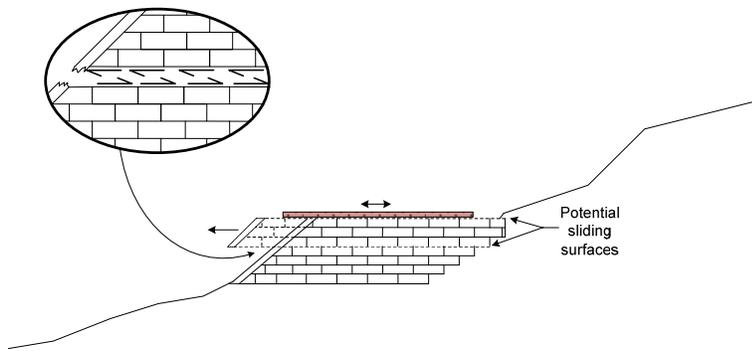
Internal seismic stability failure involving horizontal sliding between blocks and/or between the pavement system and upper layer of blocks due to seismic loading.
